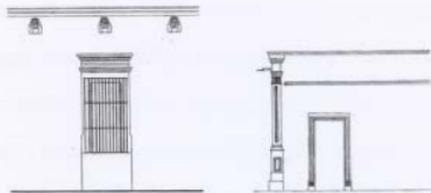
Colonial dwelling facade with Baroque detail (Gomez)
